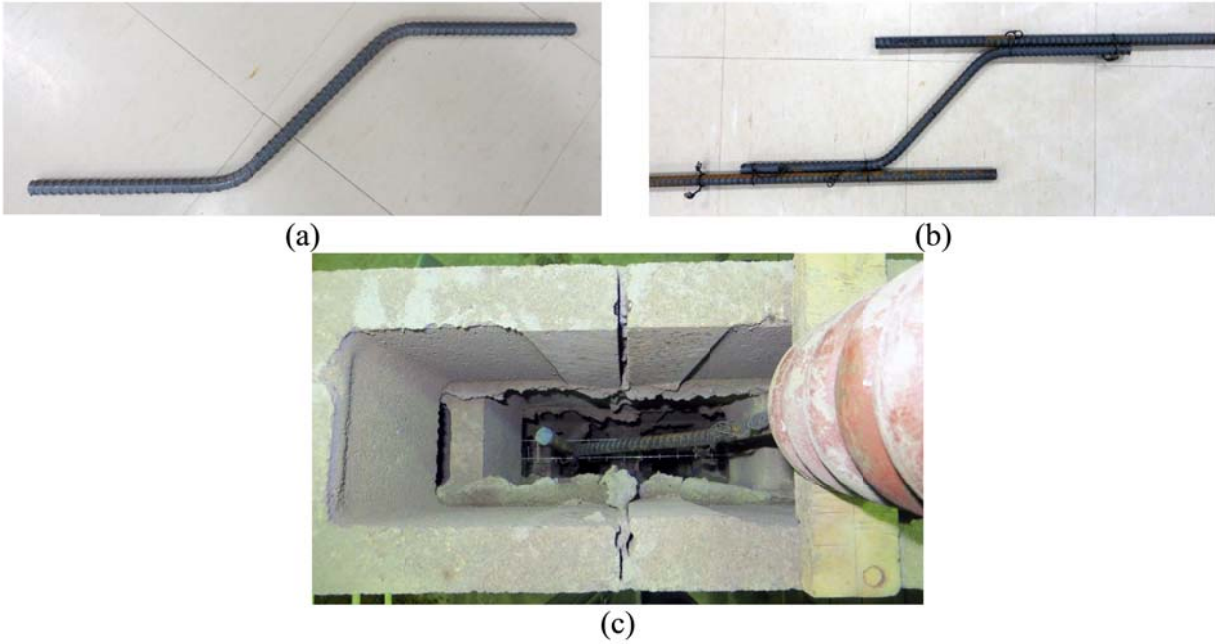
Wall Splice Specimens Featuring S-Shaped Splice Reinforcement: (a) S-Shaped Reinforcing Bar, (b) Installed S-Bar Prior to Grouting, and (c) S-Shaped Reinforcing Bar Tied Together With Longitudinal Reinforcing Bars.
